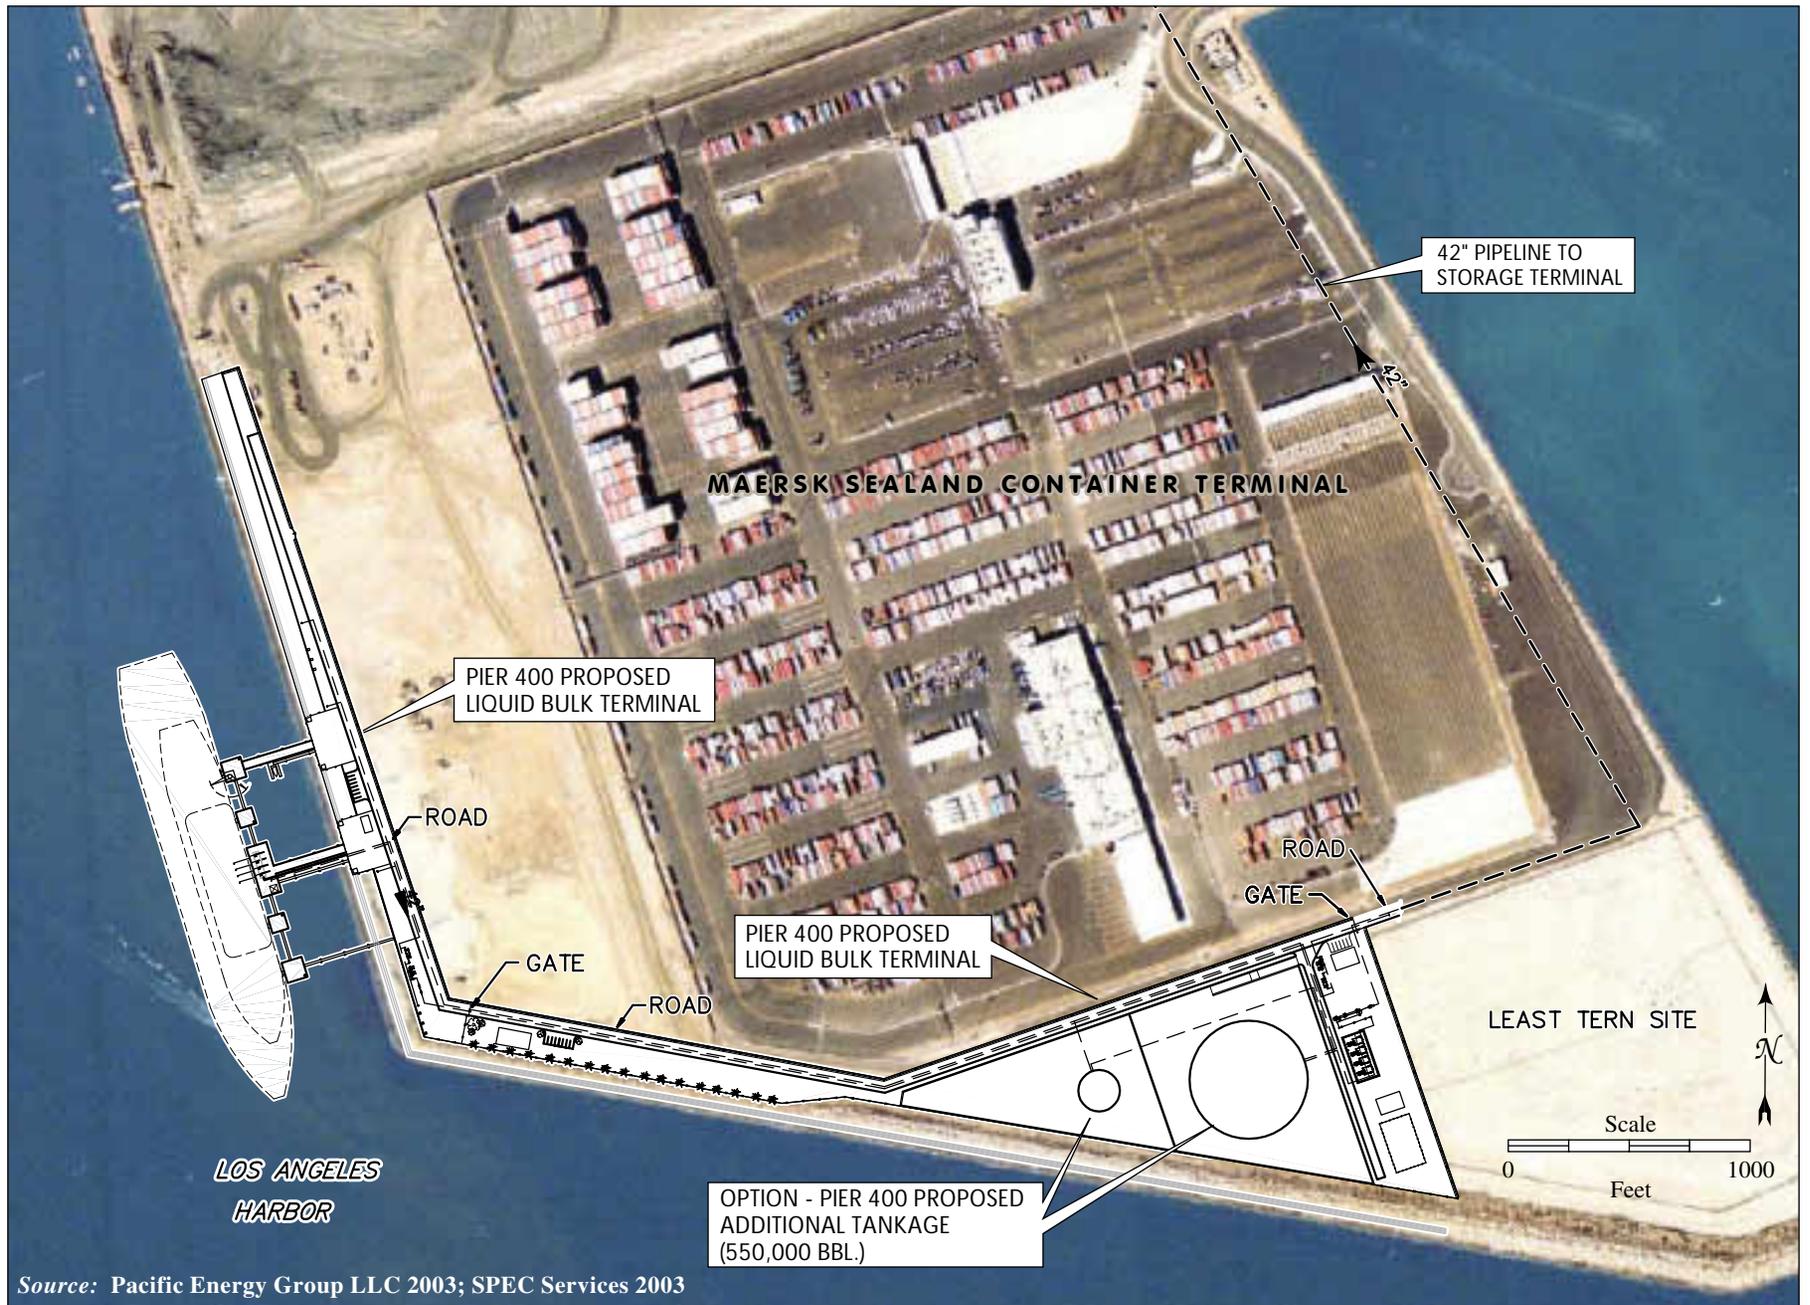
Layout of the Proposed Crude Oil Marine Terminal on Pier 400
